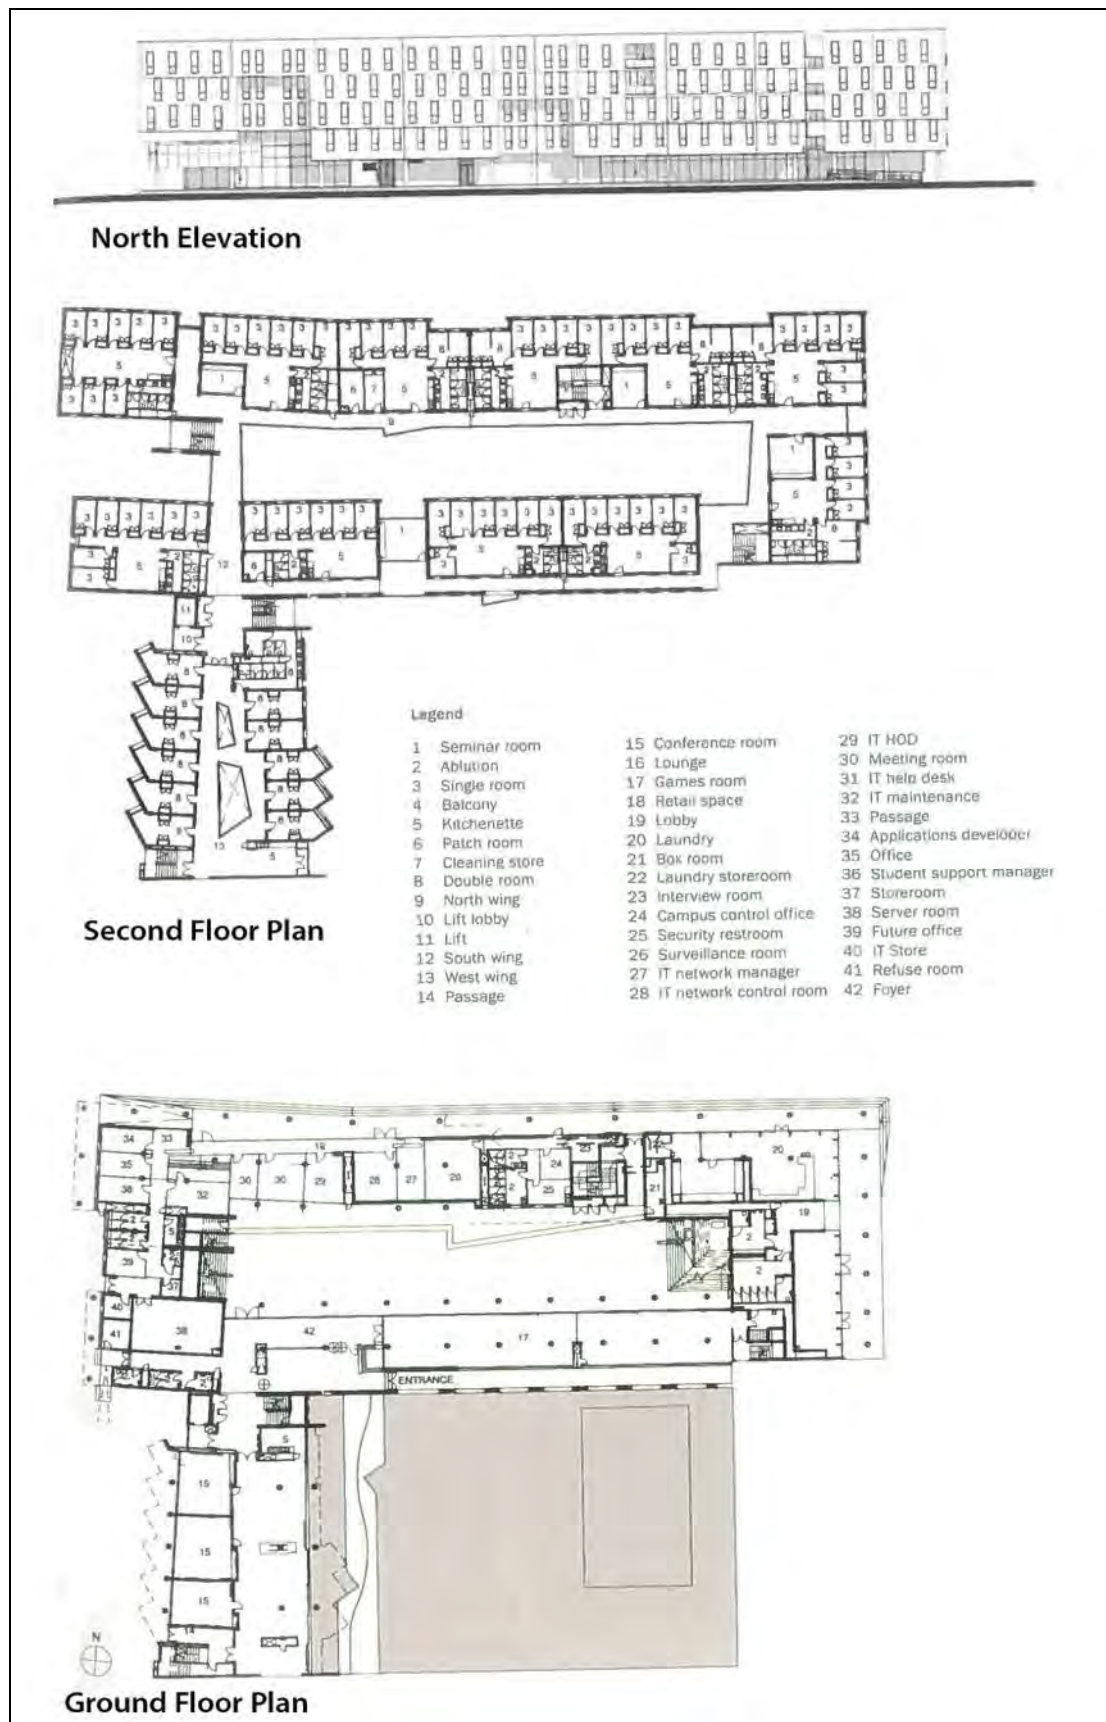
Sol Plaatje University Campus Building L001 Floor Plans and Elevation (Activate Architects).
